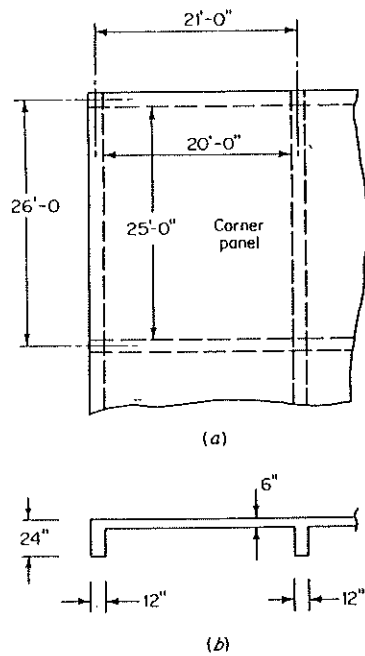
Two-way edge-supported slab: (a) partial floor plan; (b) typical cross section.
